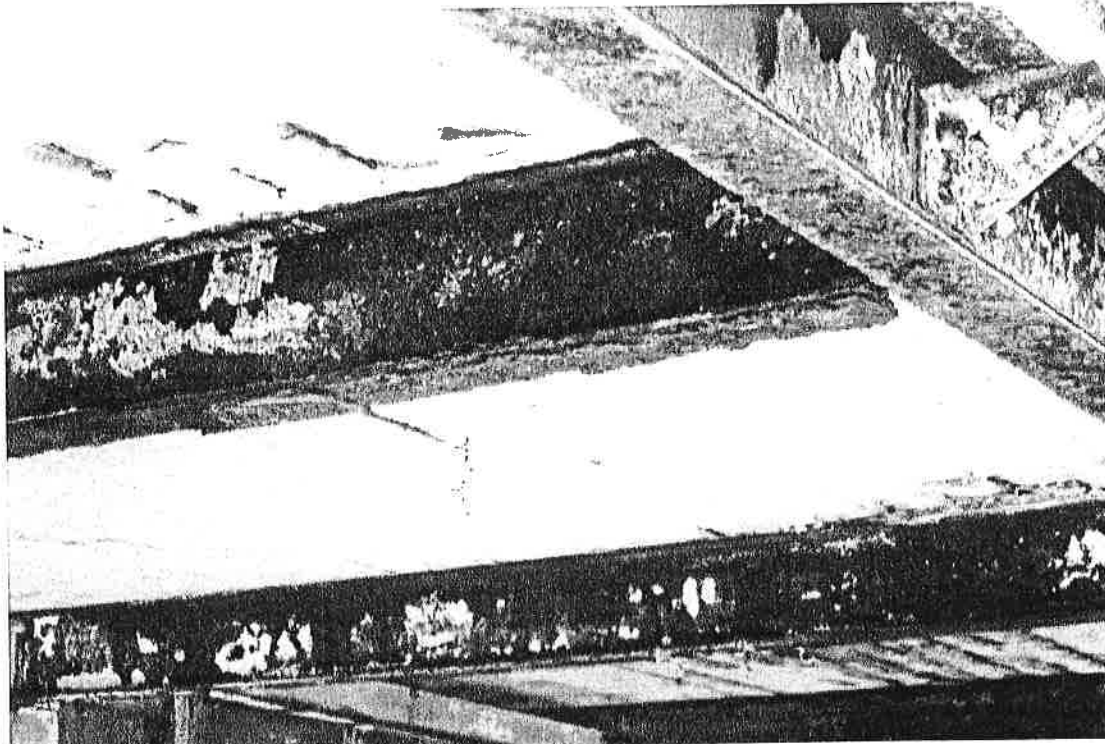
Corrosion and delaminating flanges of existing approach beams.
